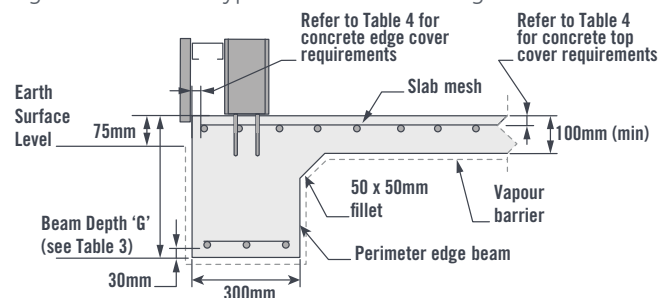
TYPICAL SECTION THROUGH EDGE PERIMETER BEAM
